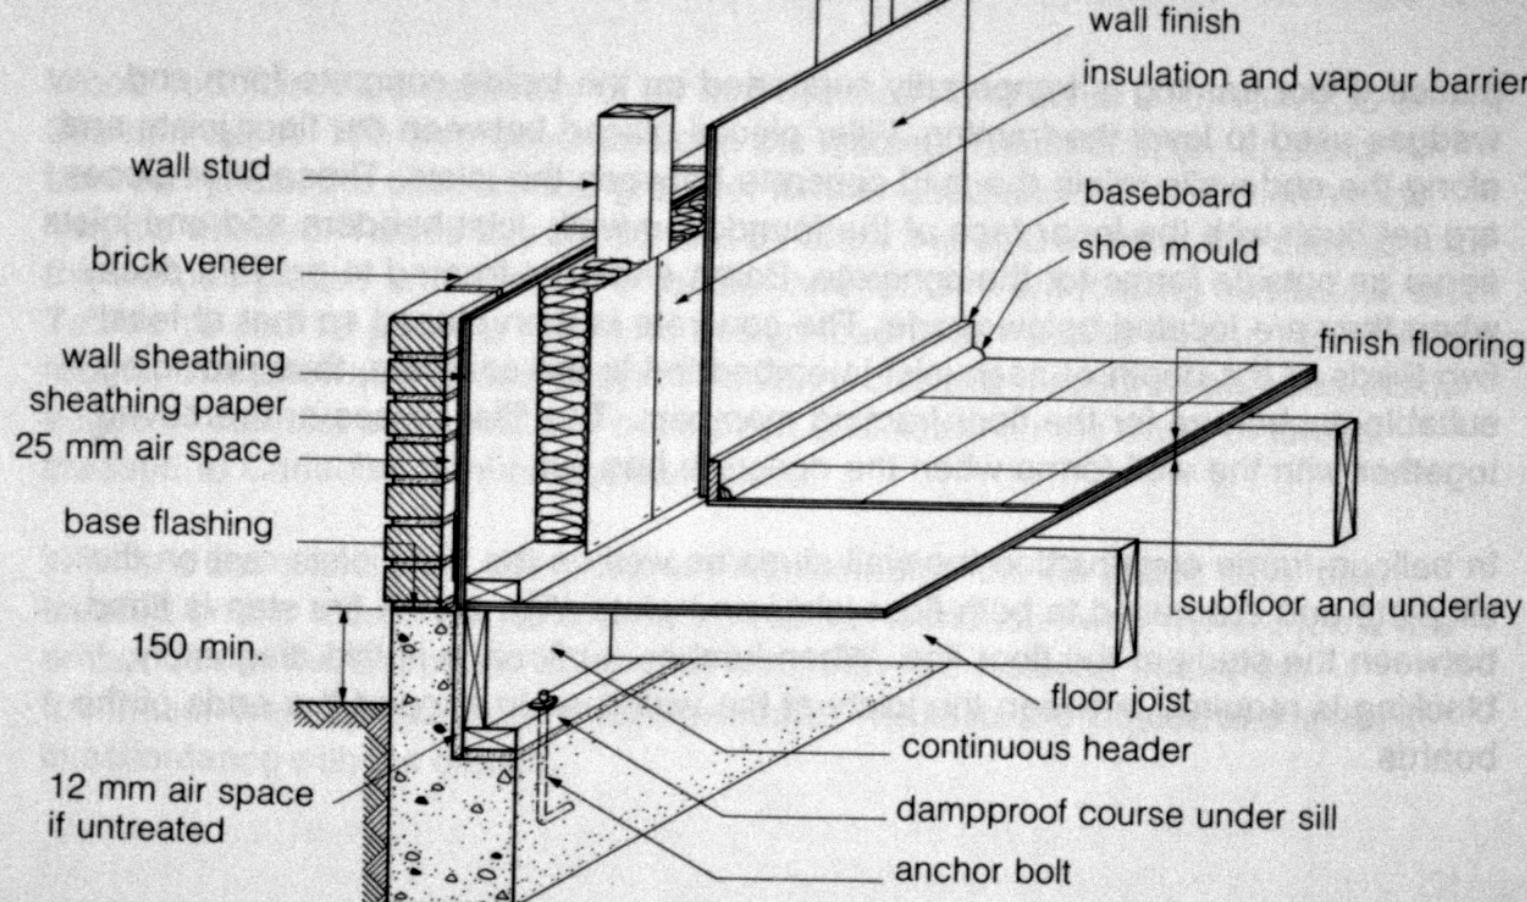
Floor joists are supported on ledge formed in foundation wall. Joists are toenailed to header and sill plate. Masonry veneer supported on top of foundation wall. Wall framing supported on top of the subfloor.
